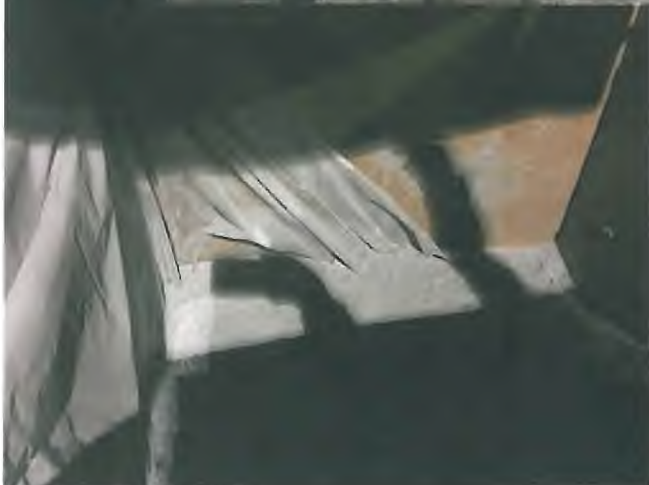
Closed Loop Refining and Recovery, 03-04-2016.
